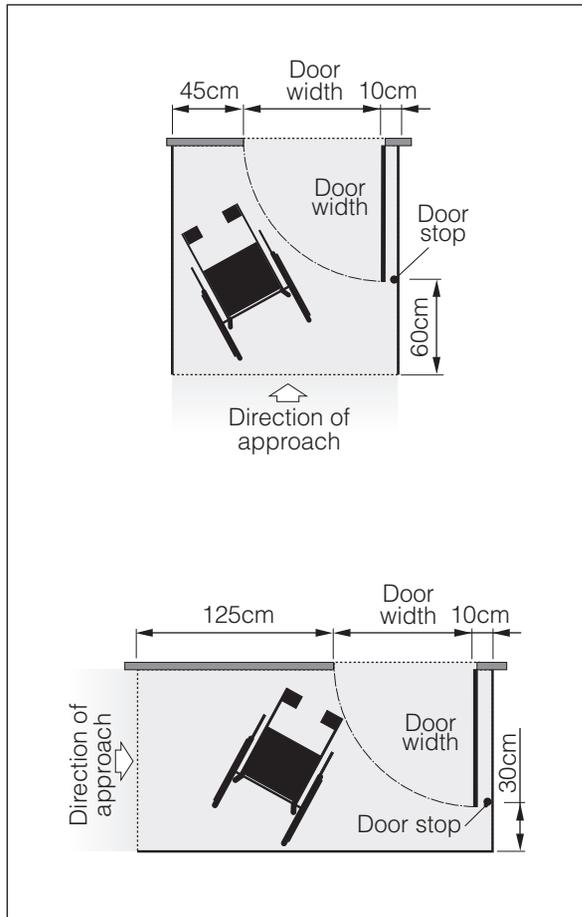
Minimum dimensions of flat platform for opening a door.
